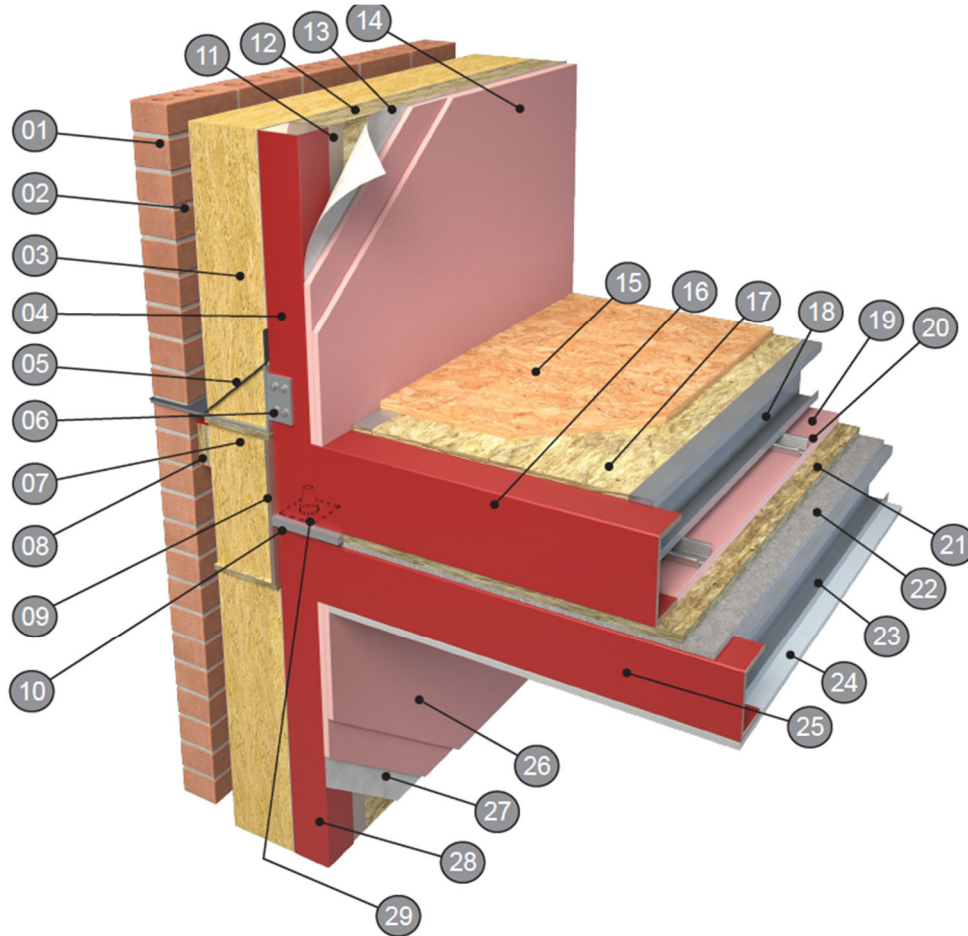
External wall with traditional brick/block outer leaf cladding to intermediate floor detail
